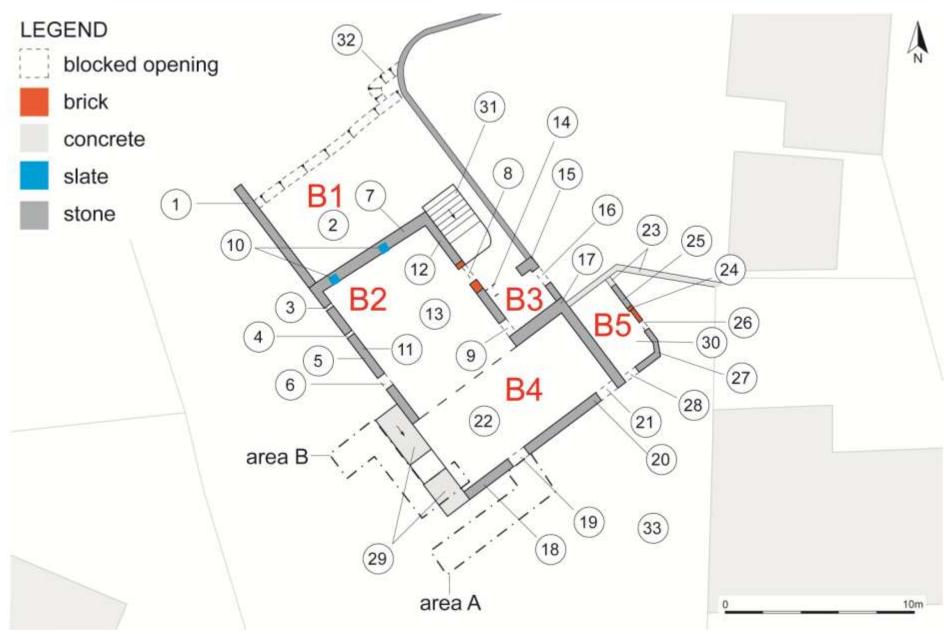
SITE PLAN SHOWING DETAIL OF BUILDING RECORDING.
